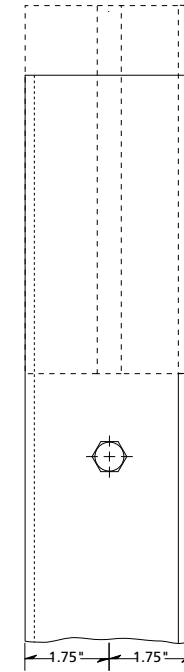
/2 x 3-1/2 x 3/16 POST ASSEMBLY PLAN VIEW
